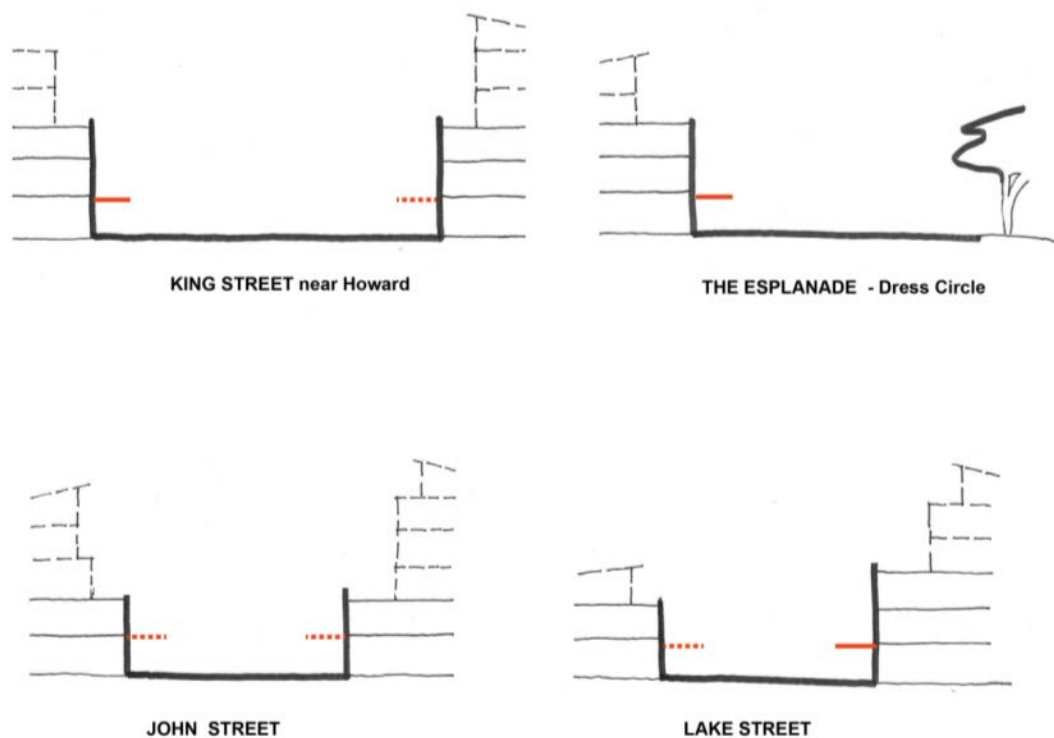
Potential street wall heights and upper level setbacks to achieve comfortable sense of enclosure
